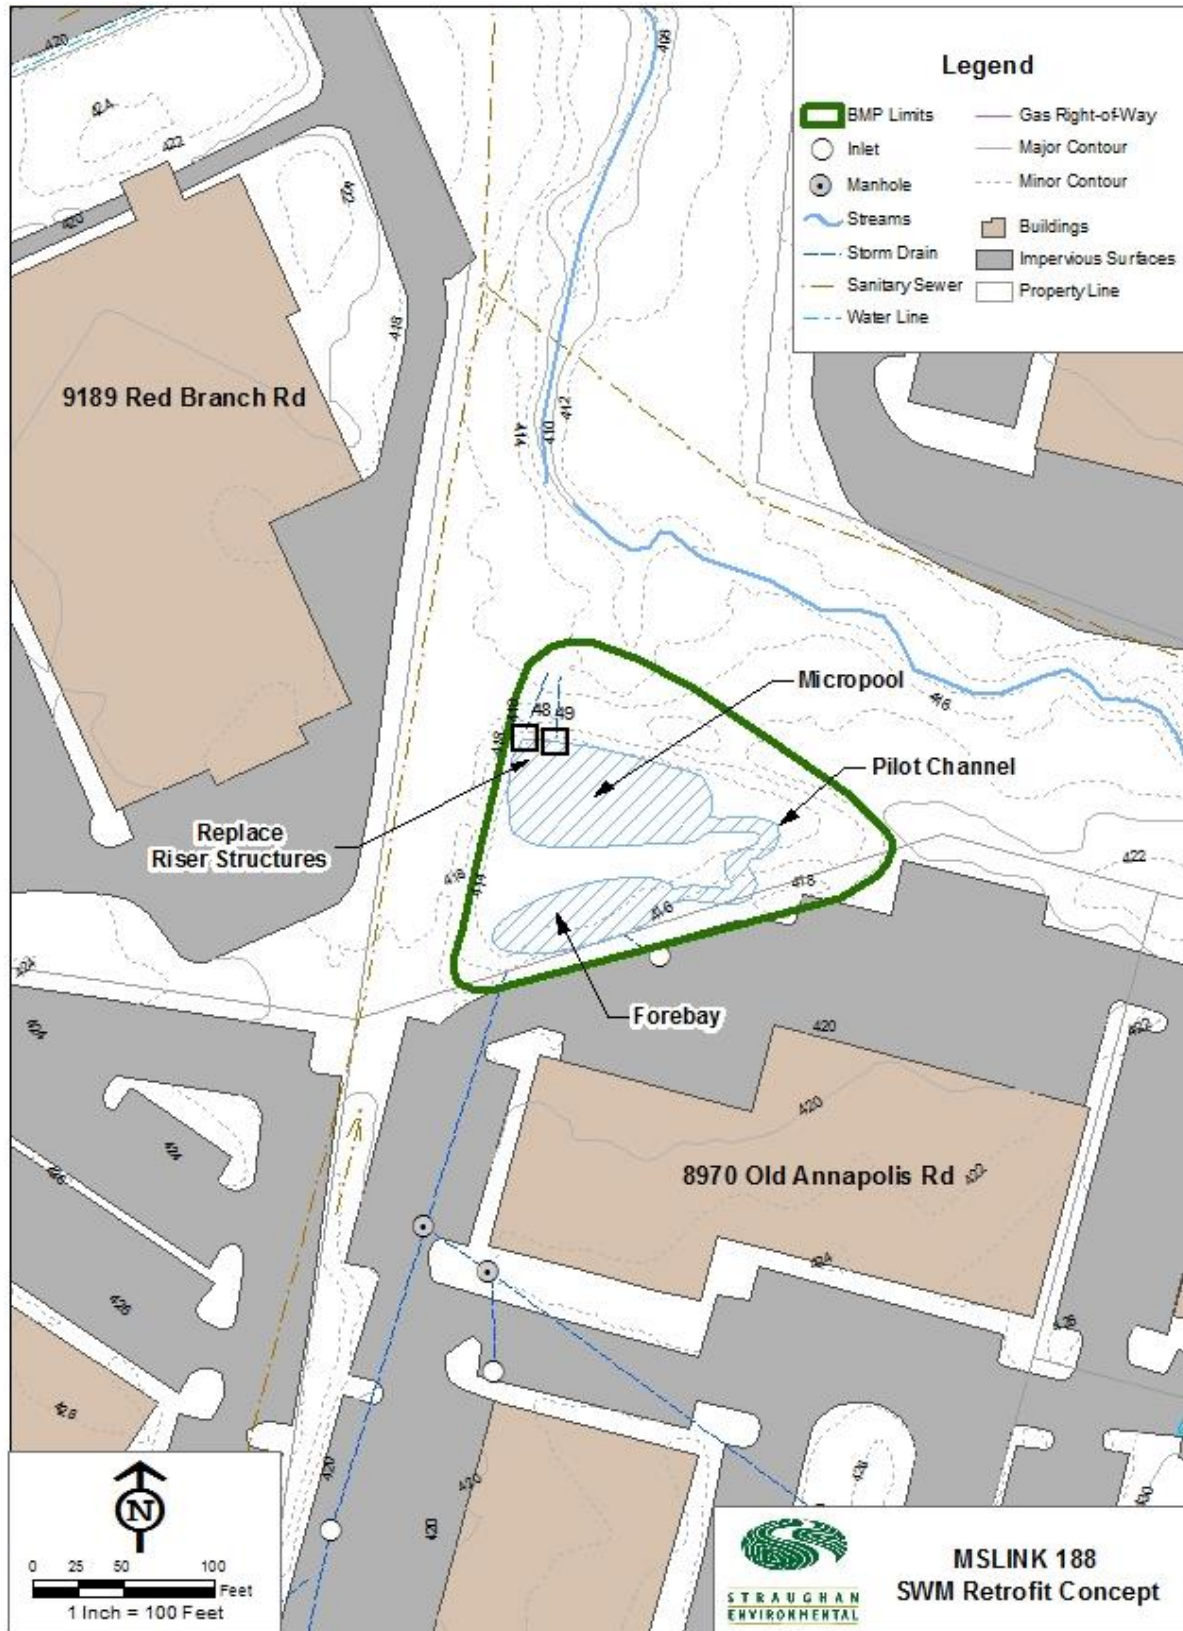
Concept Design Plan View for 8970 Old Annapolis Road, SLP-BC-D802
